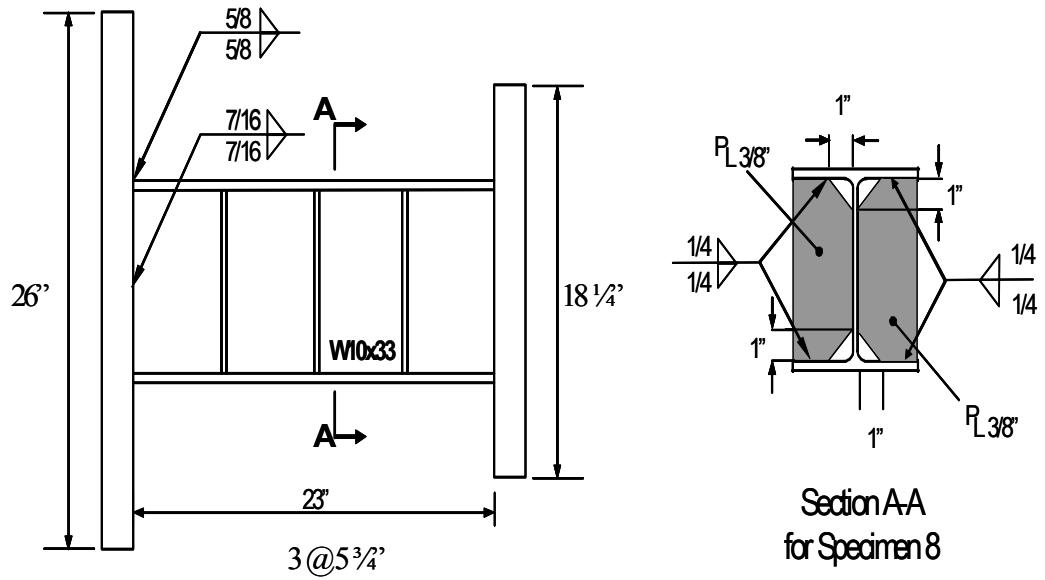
Welding and stiffener details for Specimen 8
